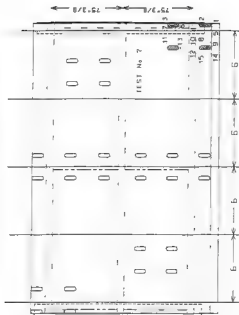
LVDT Locations (Second Bridge - Test No 7)
